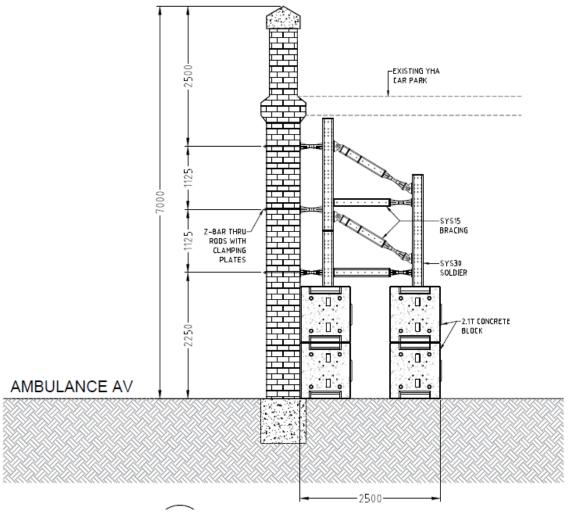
Section showing propping of Ambulance Avenue masonry facade.
